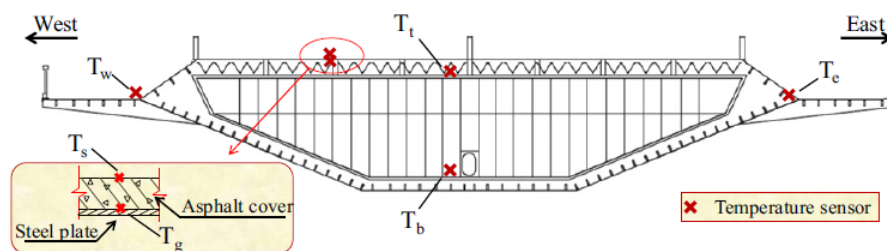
Arrangement of temperature sensors in the box girder section at mid-span
